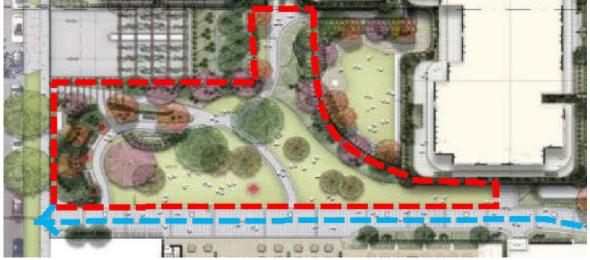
Proposed Park. The red outline indicate the publicly accessible space
